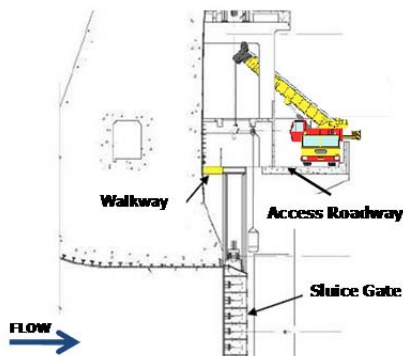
Typical cross section (A-A) through sluice gate showing access issues from roadway
